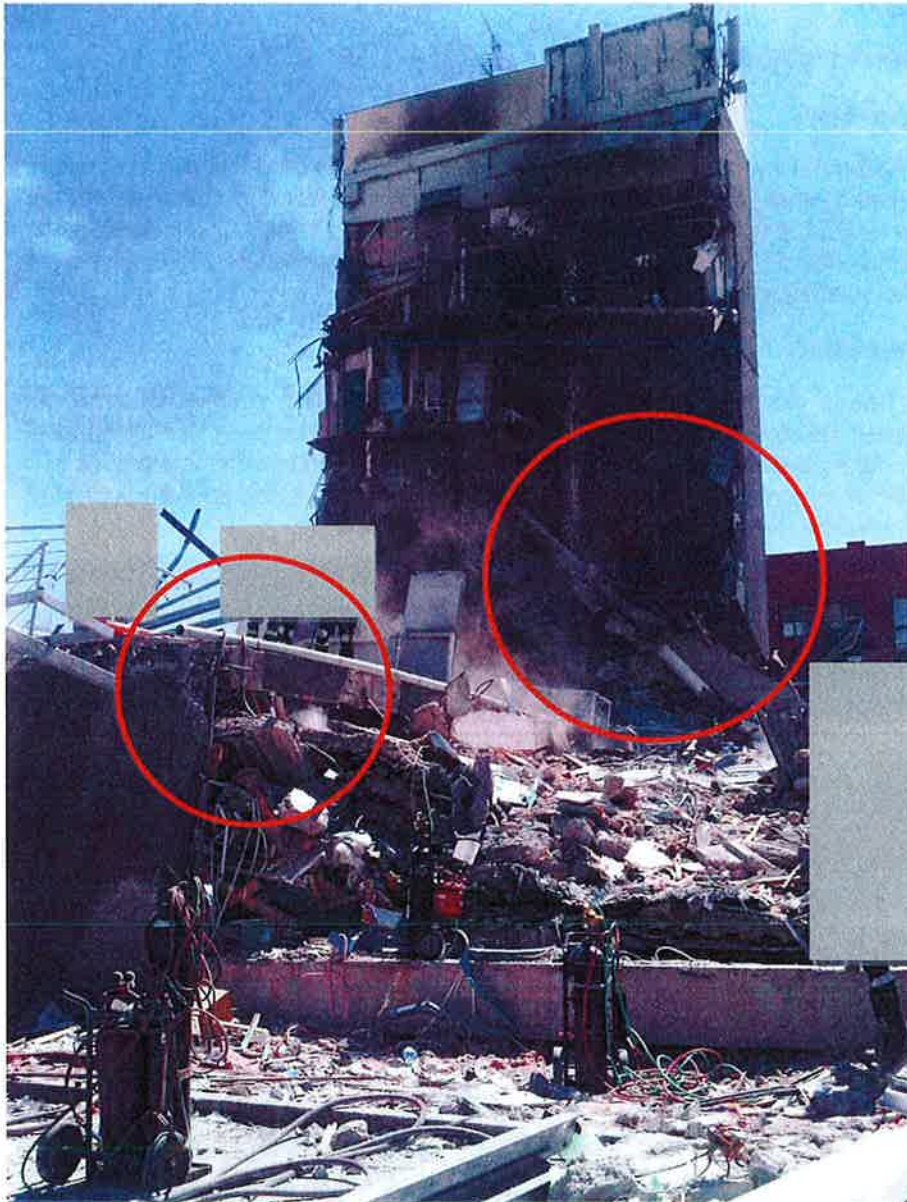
View from Cashel Street east side of Line 1 with Line 1 South Wall lying on debris at left; trapezoidal end profile of floor slabs laying on top of each other in foreground; A portion of floor slab highlighted, appears to be still in contact with the South Wall at Level 2 and may have prevented the South Wall breaking over at ground level. The collapsed column on Line 4-D/E at the North Core in the background is also highlighted.
